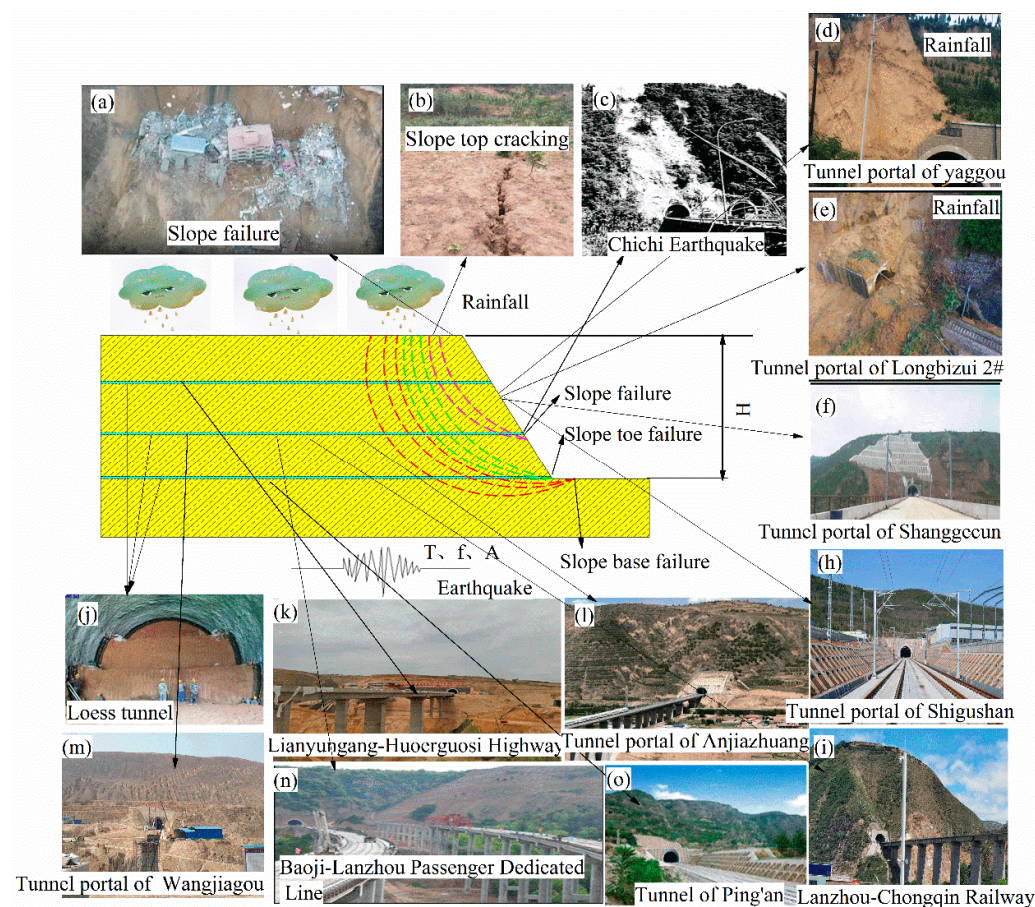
Loess portal mode, tunnel portal slope failure mode under earthquake and rainfall action. (a) Loess landslides; (b) Top of slope cracking; (c) Tunnel portal slope failure under earthquake action [21]; (d), (e) Tunnel portal slope failure under rainfall action; (f), (h) Tunnel portal slope; (j) Loess tunnel; (i), (k), (l), (m), (n), (o) Loess tunnels with different portal elevation.
